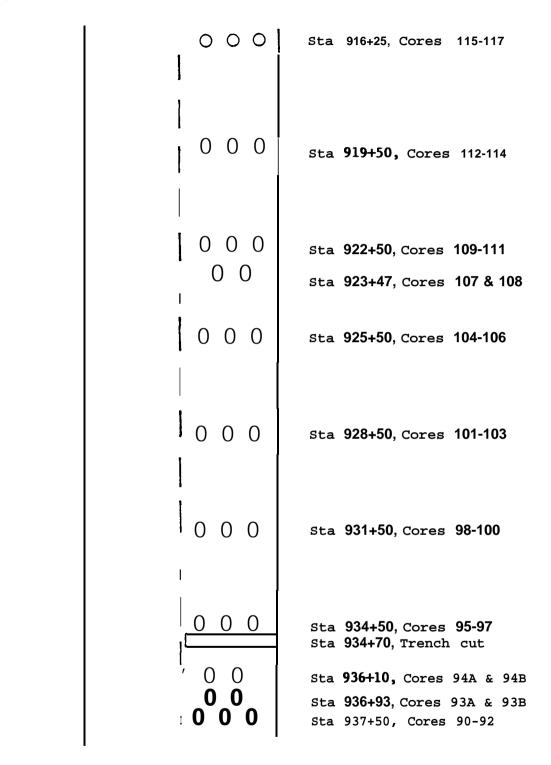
Layout of Test Section North Bound Lanes, 1-55, Near Collinsville, IL.
